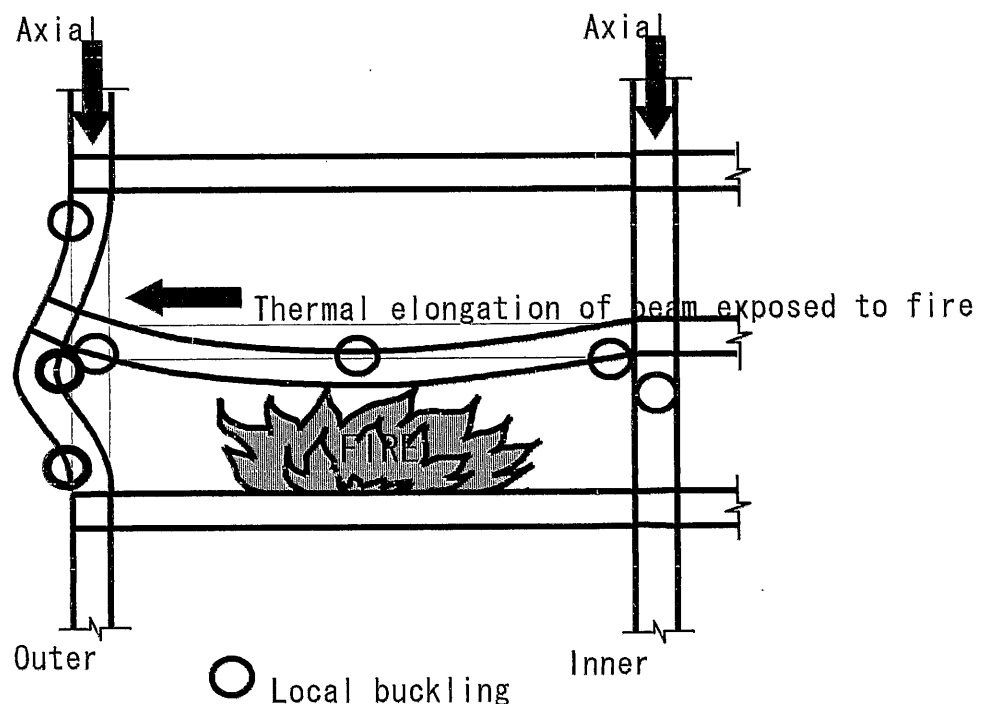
Thermal elongation and bending deformation of steel structure exposed to fire.
